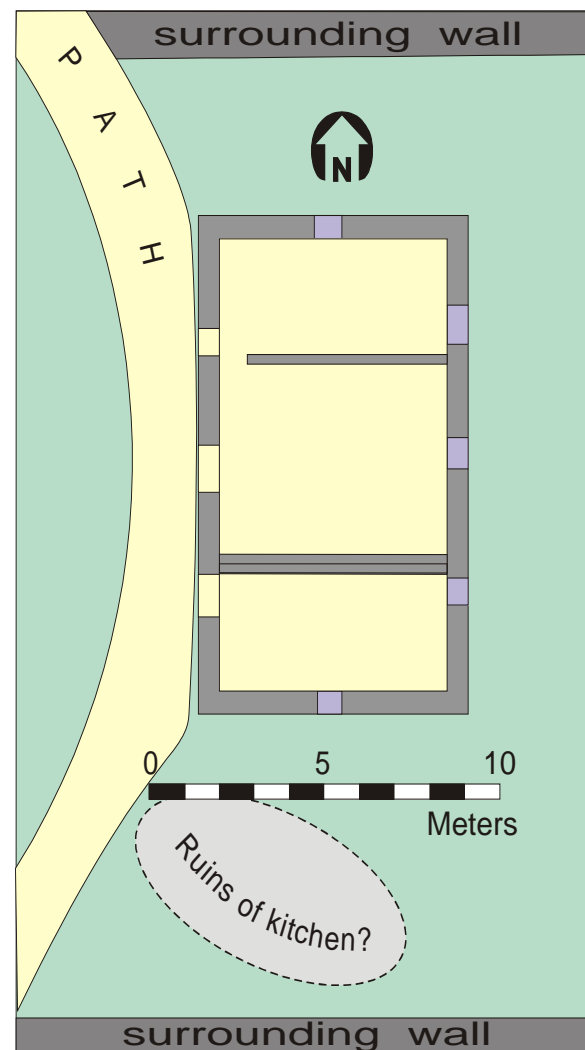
Plan view of the house ruin. Blue openings in walls are windows. Other openings are doorways.
